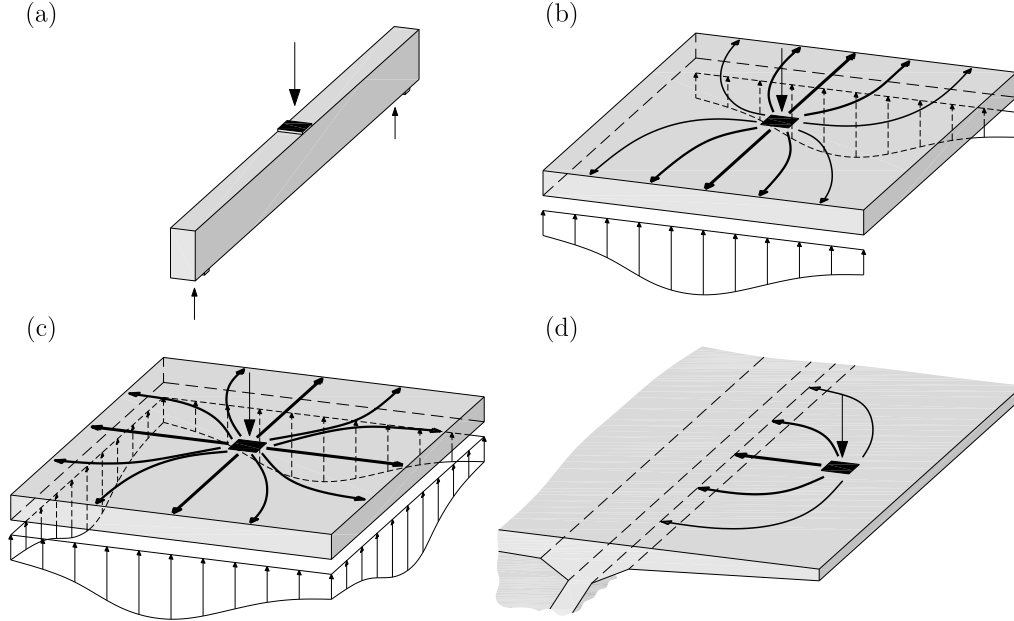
Structural reinforced concrete members failing in fatigue shear loading: (a) simply supported beam; (b) slab supported on two edges; (c) slab supported on four edges; and (d) cantilever slab
